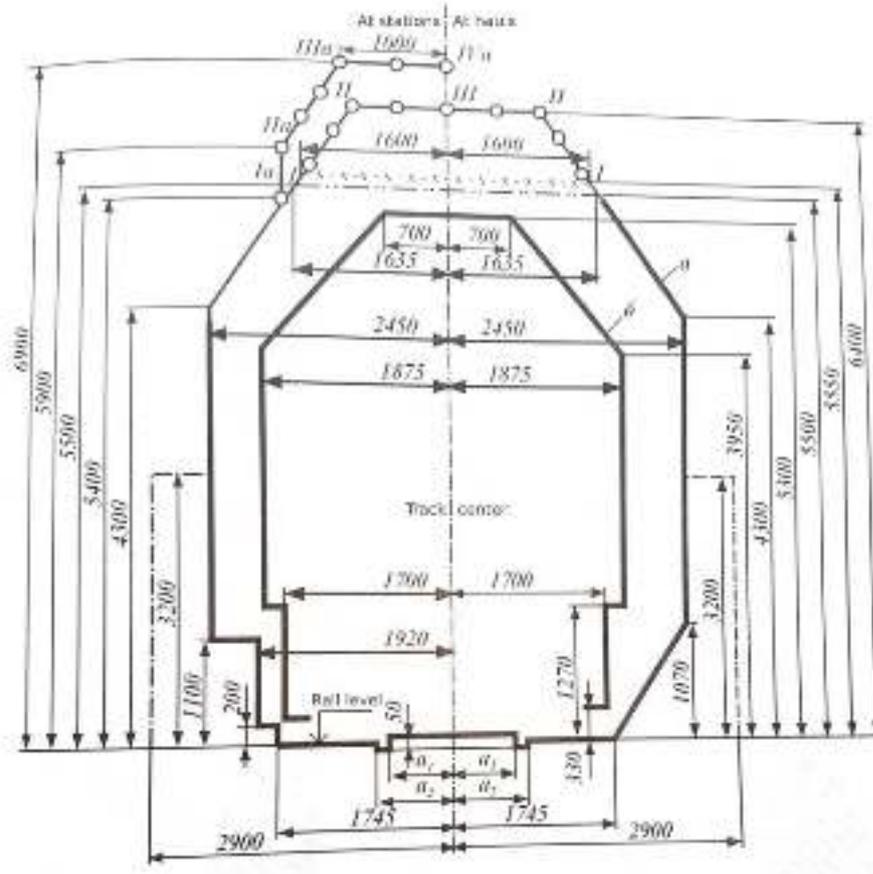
Combined dimensions of a carriage with 1524 mm gauge
